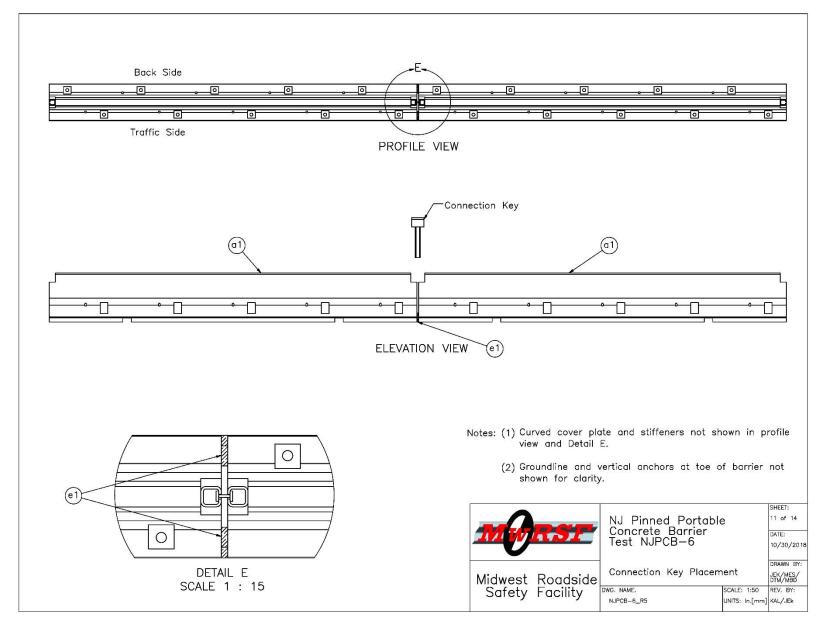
Connection Key Placement Details, Test No. NJPCB-6
